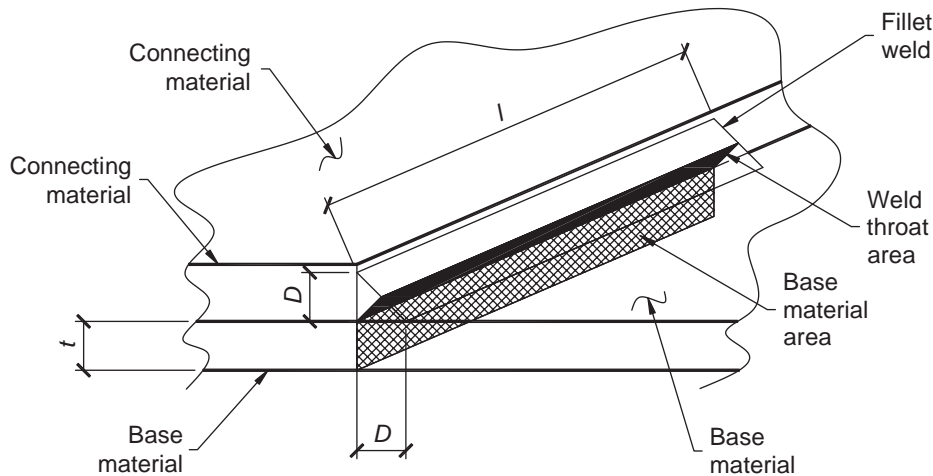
Weld and base material shear rupture area in a one-sided weld condition.
